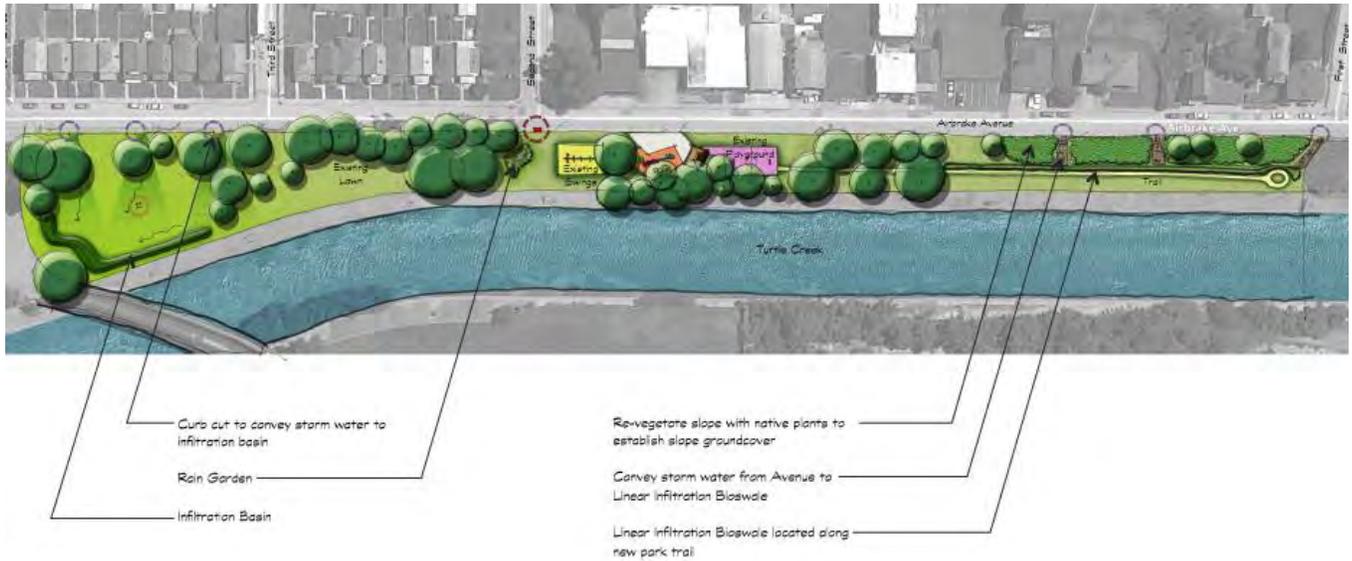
Airbrake Avenue GSI Concept Layout, Wilmerding Borough
